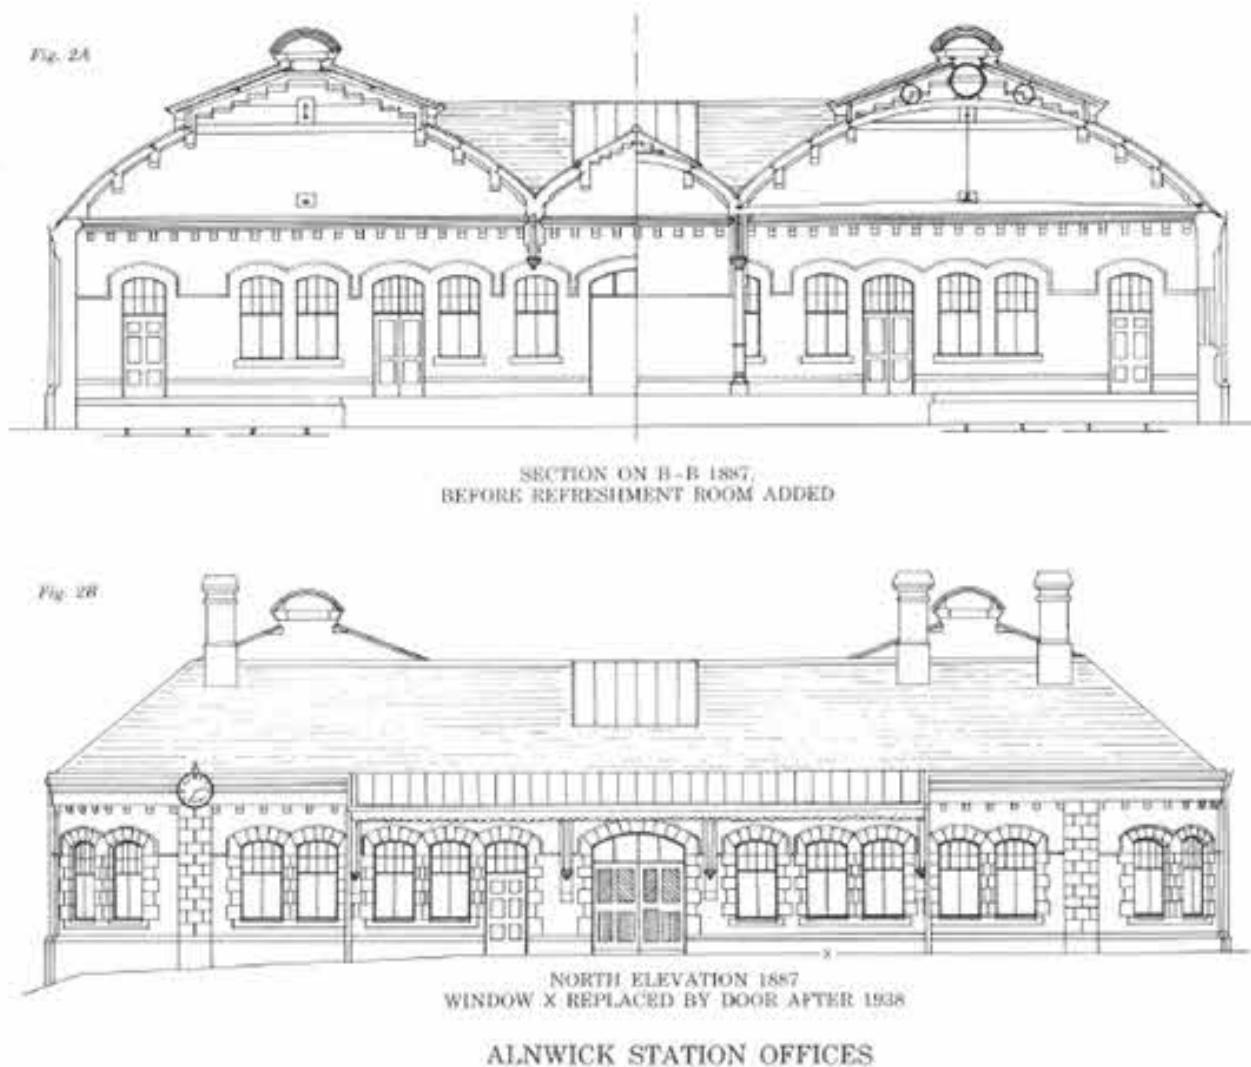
Illustrations From the North Eastern Branch Line Termini Book (pages 25) – main elevation to the North and Section through the building. [*7]
